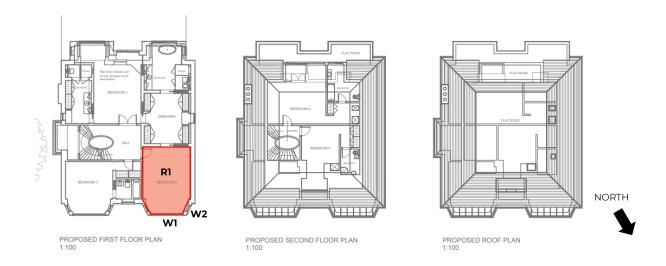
59 Redington Road layout drawings First Floor, Second Floor and Roof Plan (habitable rooms and adjoining windows assessed are highlighted).
